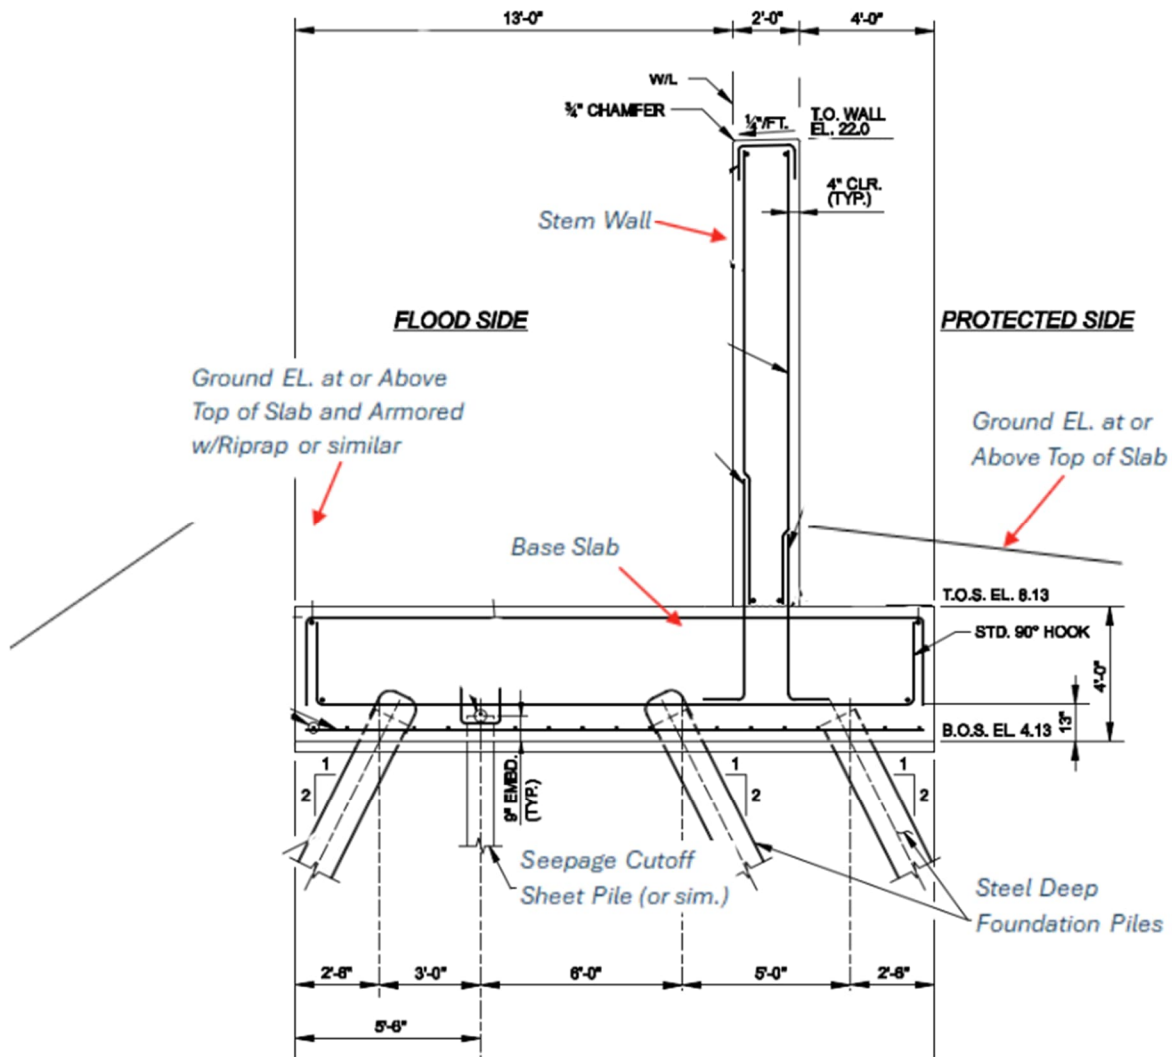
Sample Cross-Section of a 14-Foot-Tall T-Wall Floodwall from Previous USACE Project
